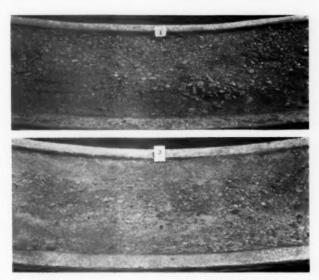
Sections of Track 3 at 160,000 Wheel-Trips, Just Before the First Sprinkling. Upper, Section 1, Which Is Also Representative of Section 2; Lower, Section 3. Sections 4 and 5 Were in Slightly Better Condition Than Section 3.
